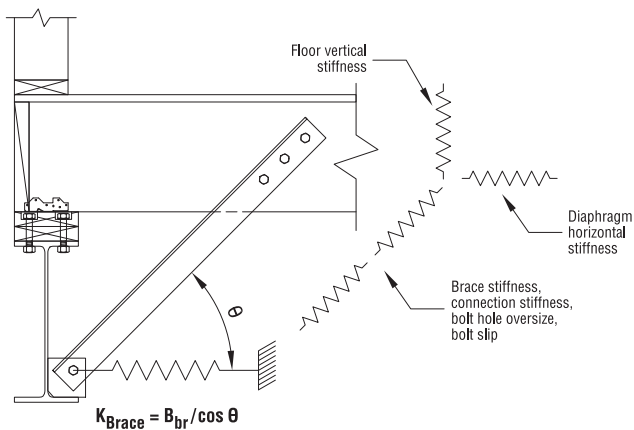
Realities of Beam Bracing in Light-Framed Construction
